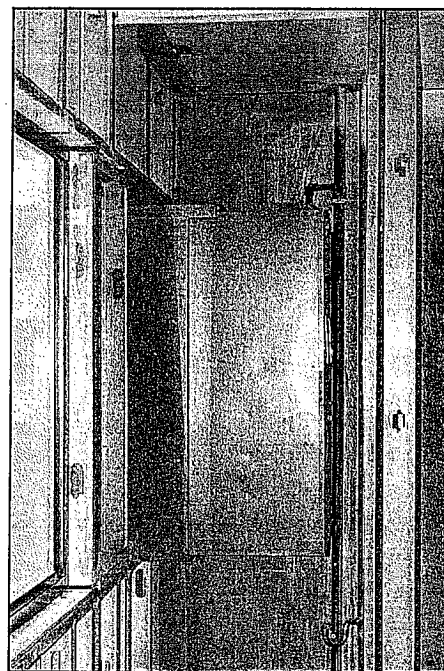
Wall sleeve fastened to steel 2 in. x 4 in. studs with screw fasteners shot through sides of wall sleeve.
